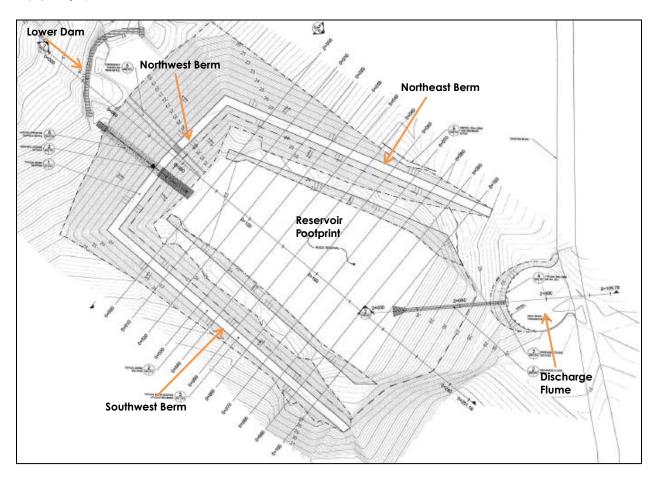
Current Dam Layout (Extract from Construction Drawing No: 101)
